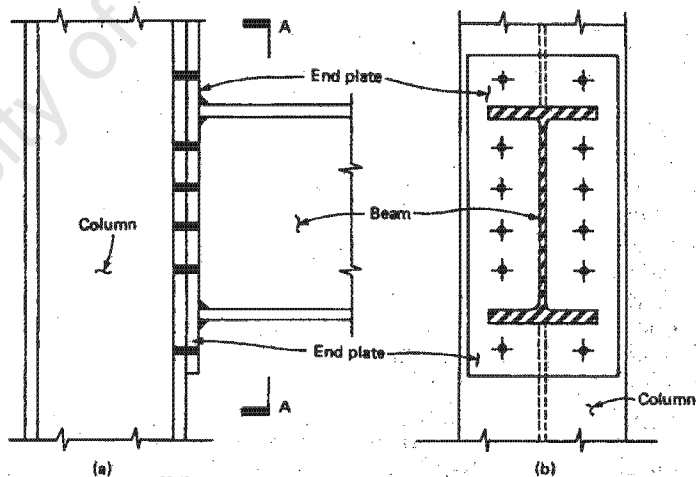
<sup>[64]</sup>: Column-to-beam bolted end plate connection
